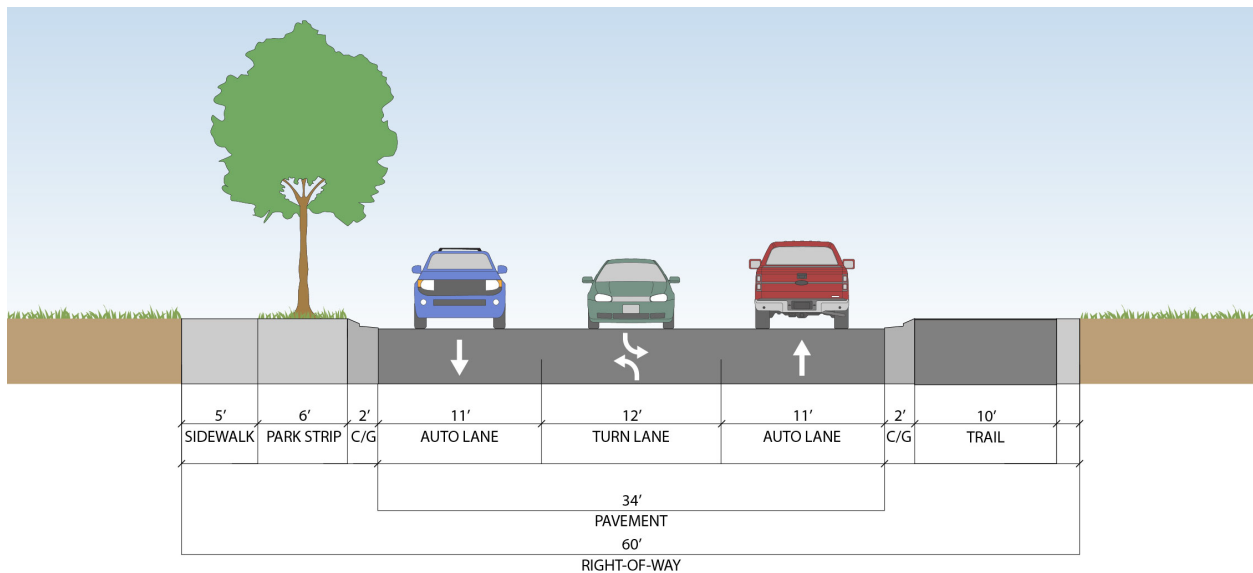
Urban Active Transportation Route Cross-Section, Trail and Sidewalk Configuration
